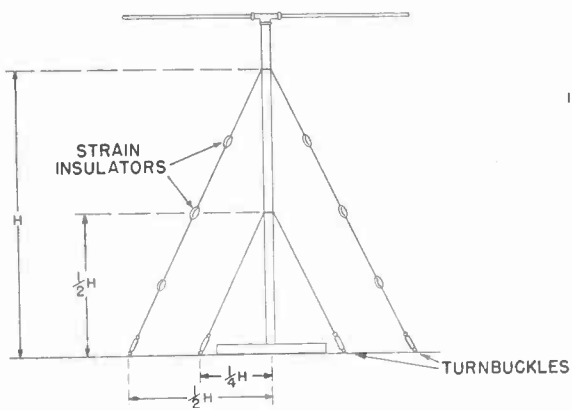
This drawing shows the dimensions and locations of the guys needed to keep a tall mast in place.
